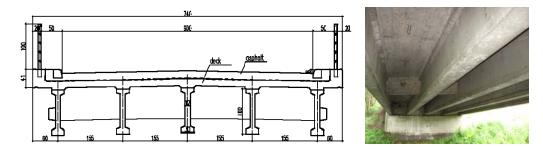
Bridge cross-section and bottom view of the bridge before reconstruction.
